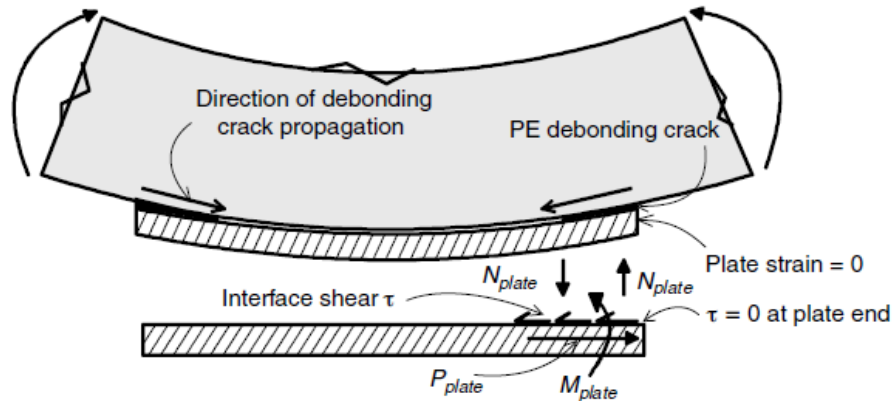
Plate end debonding in externally bonded beams (Oehlers 2006).
